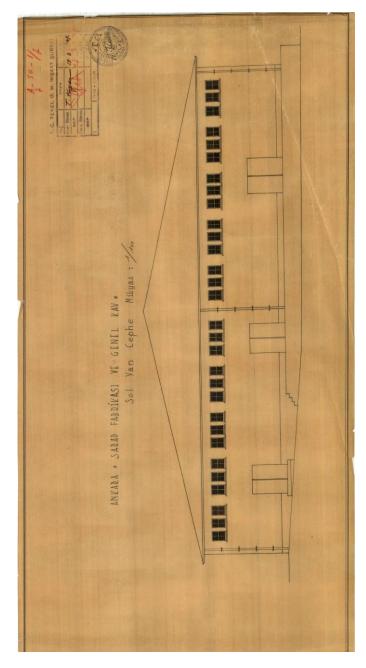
The original drawing of wine and whiskey filling building, west elevation (Source: T.T.A Archive)
